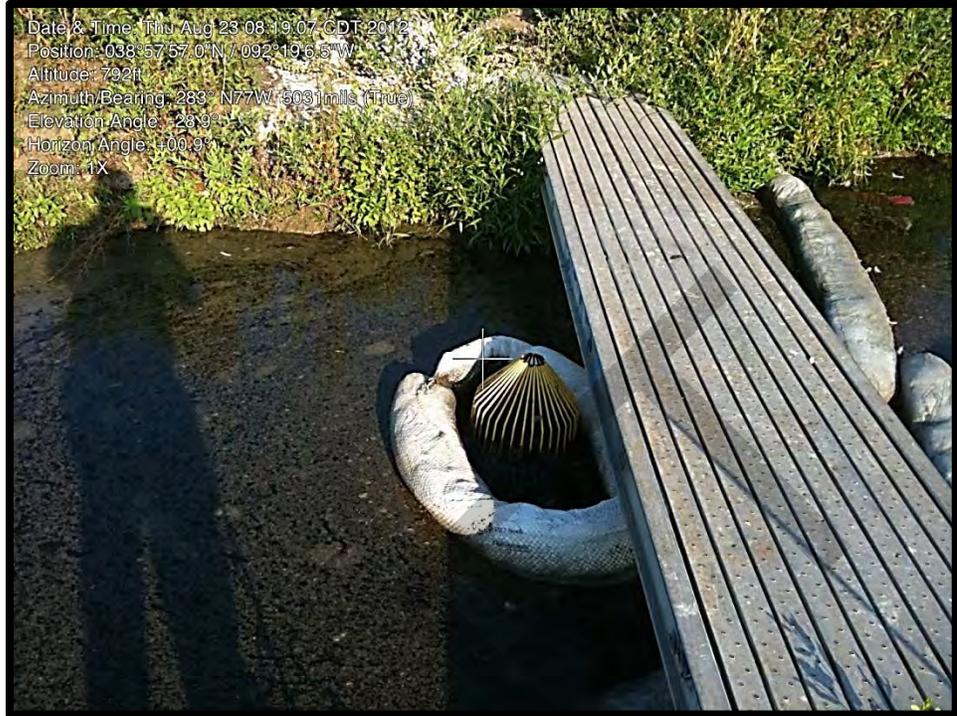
Riprap near Outfall Drain at Southwest Inside Slope
